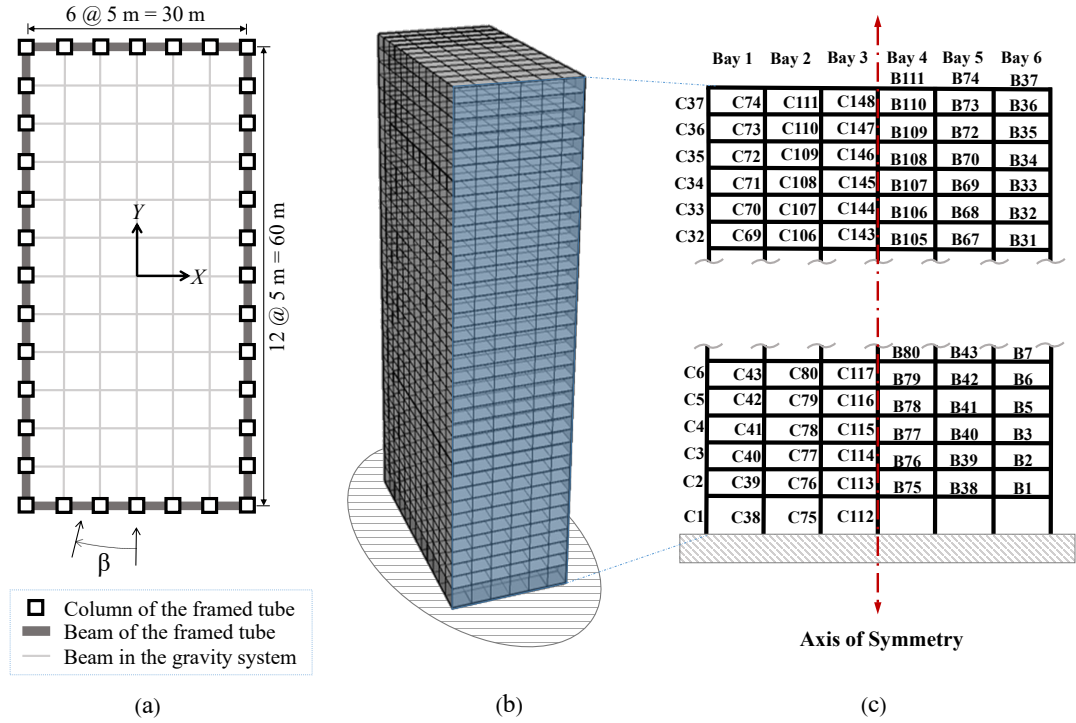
37-story building system: (a) Building plan, (b) Isometric view, (c) Frame layout showing beam and column assignments.
